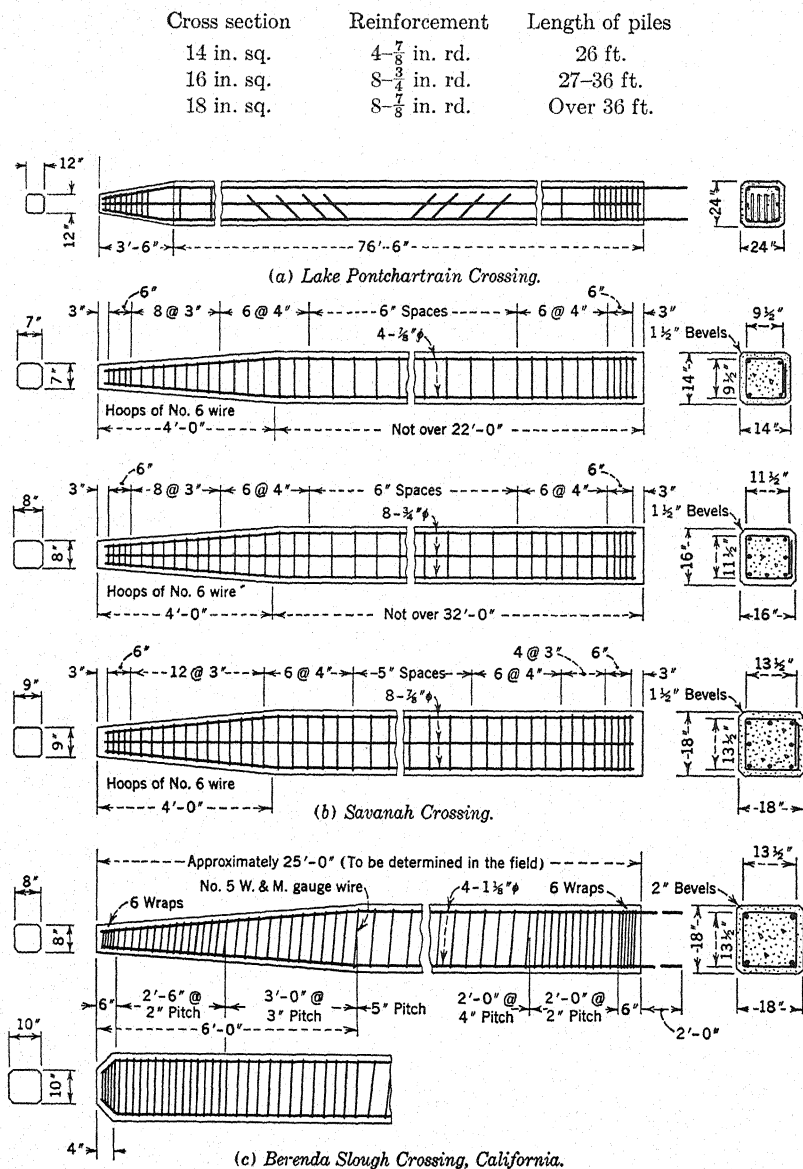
Details of Precast Concrete Piles. (See p. 430.)
